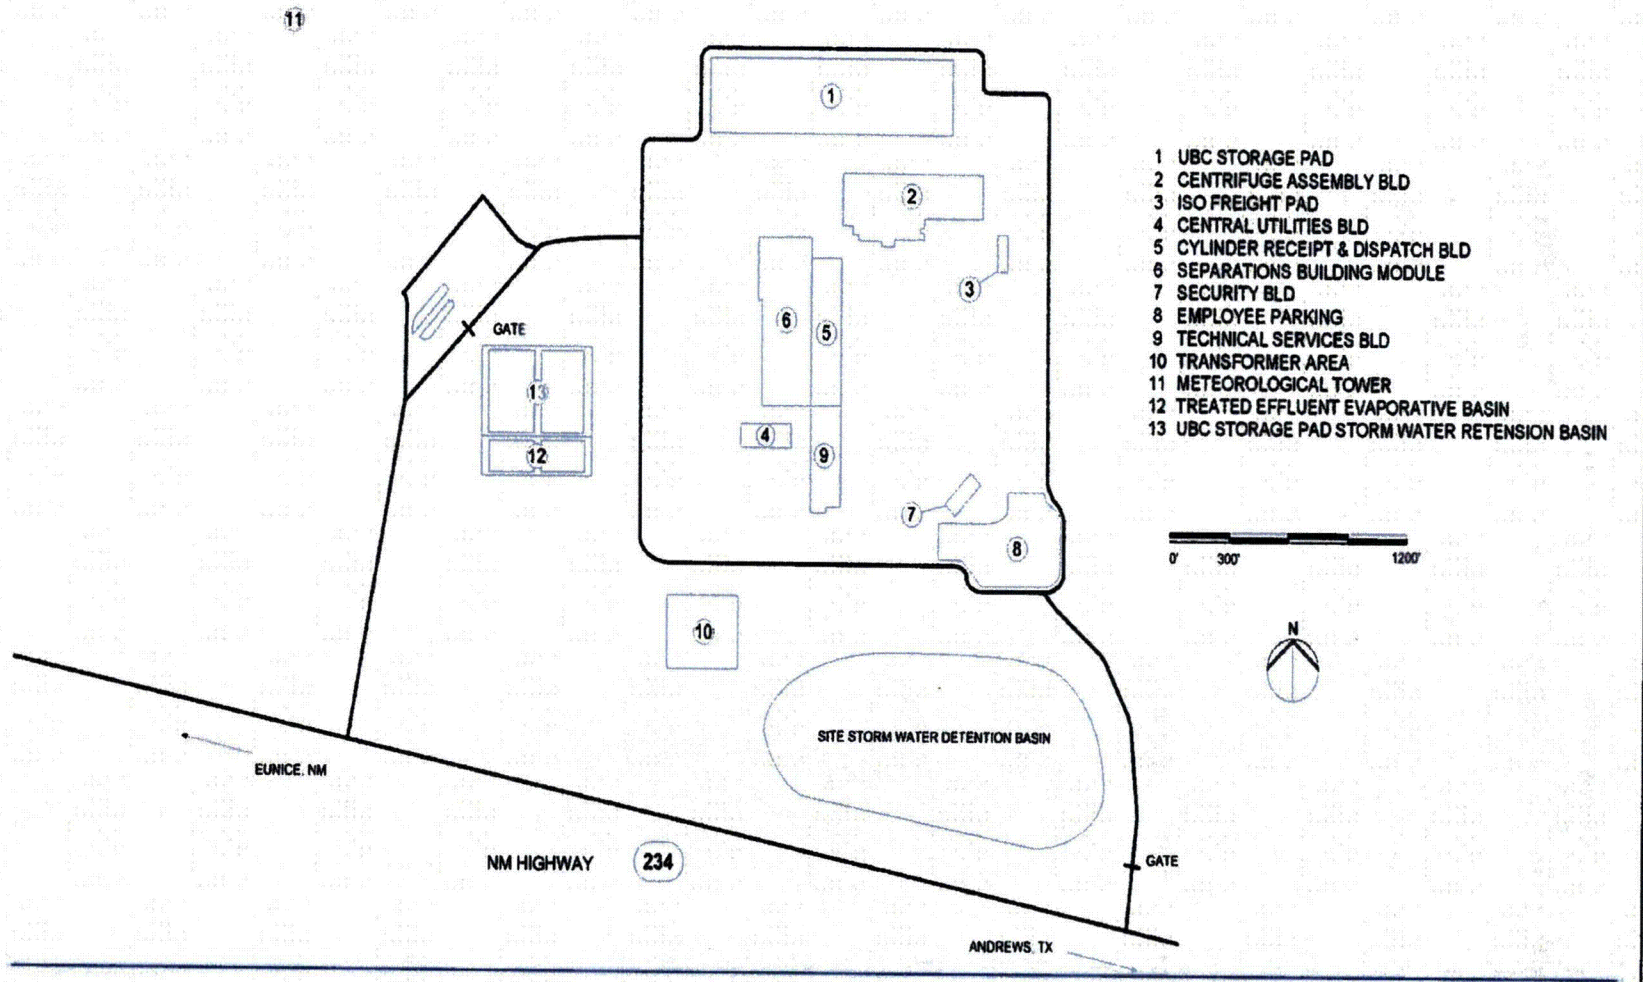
Site Plan with Stormwater Detention/Retention Basins
